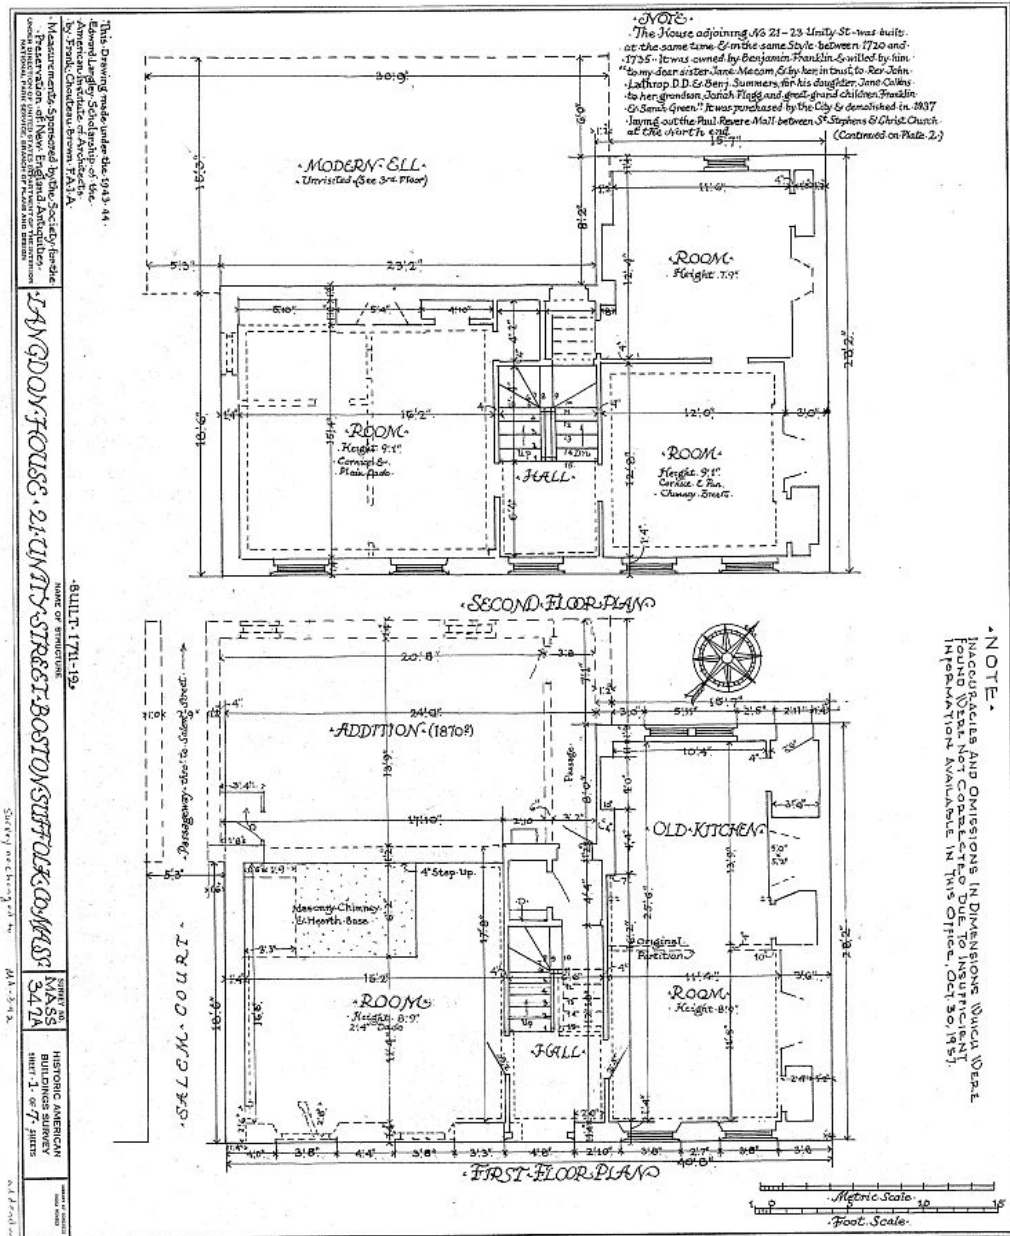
The Clough House floor plan (Cummings and Overby 1961)
